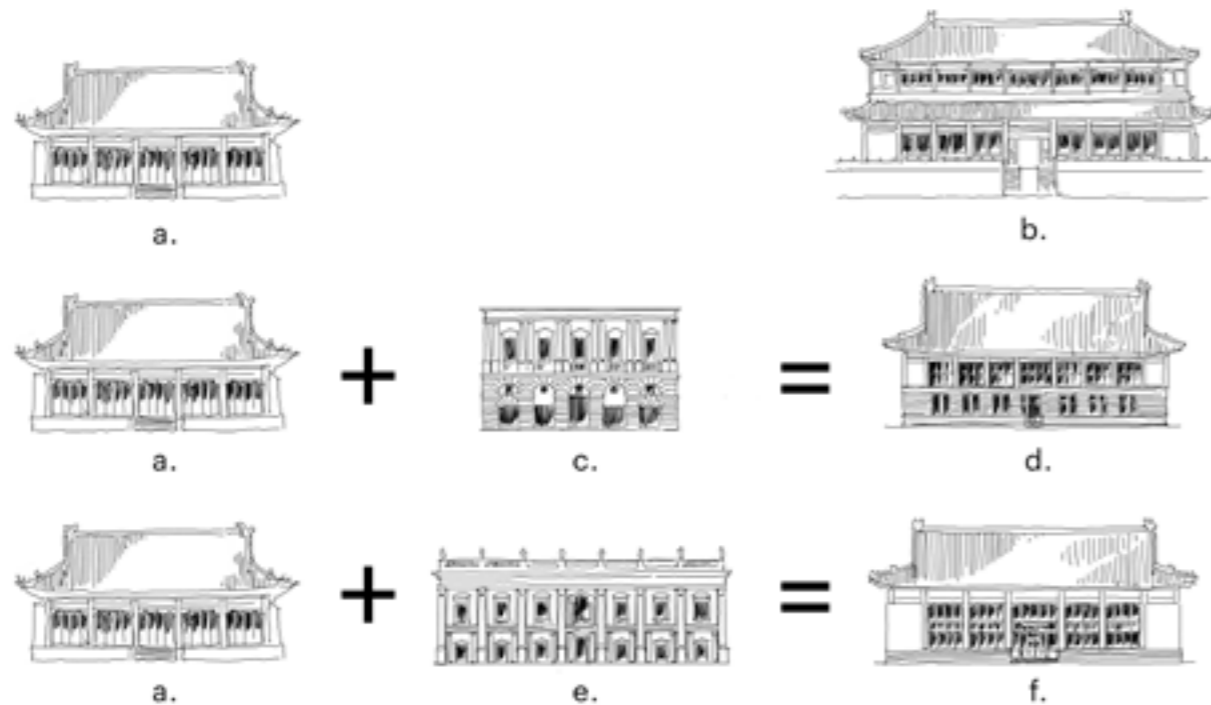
Diagrams synthesizing two-story elevations: (a) typical traditional Chinese palace, after Prince Gong's Mansion, Beijing; (b) traditional way of forming two-story buildings with an eave as a horizontal division; (c) Renaissance palazzo, after Bramante's Palazzo Caprini; (d) Murphy's Ginling College building; (e) colossal order, after Michelangelo's Campidoglio; (f) Murphy's Yenching building
